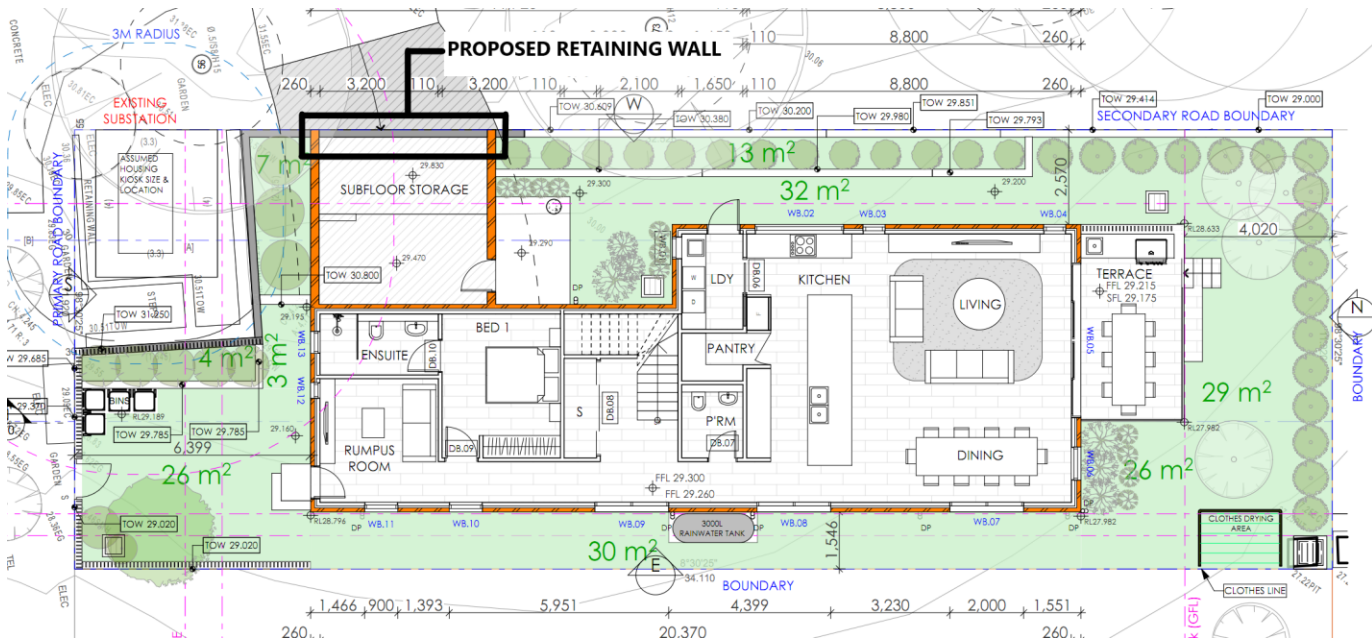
Ground Floor Plan (Source: PTI, Project No.: P563, Dwg No.: 06, Revision 7)
